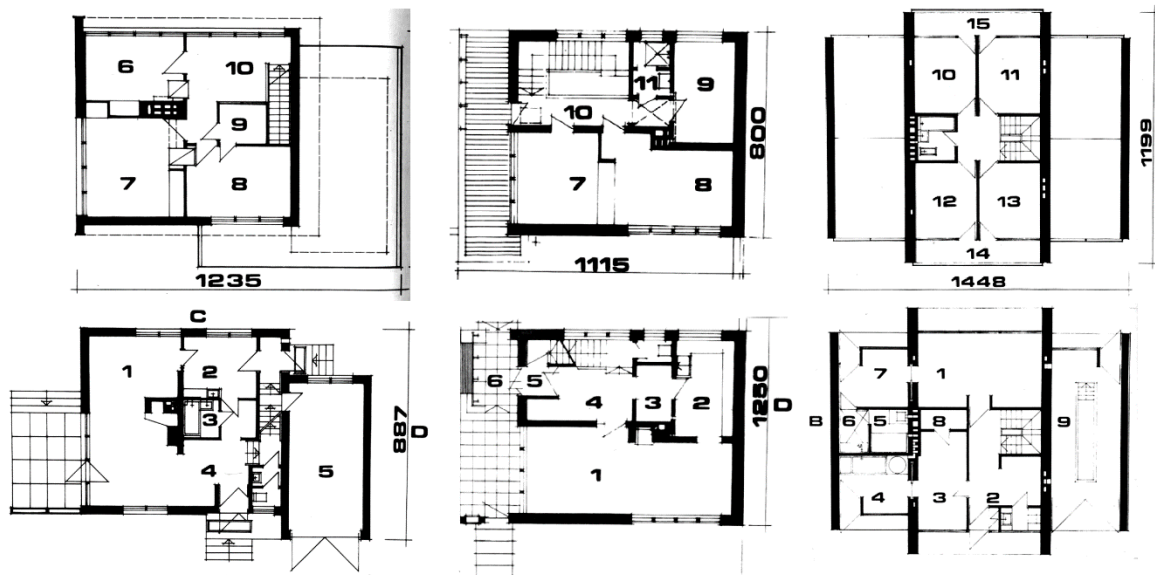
Examples of box house ground floor and upper floor layouts from 1976 (left to right: IE-03 (H. Kingo); 80-74 (J. Pärnik); 91-74 (L. Aljaste)) (Berends & Dobrõš, 1976)
